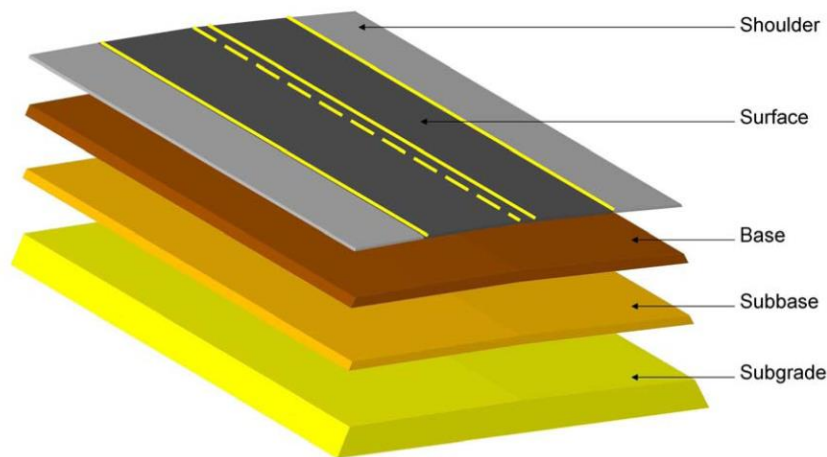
Typical Road Structure Cross Section (Soares 2005)
